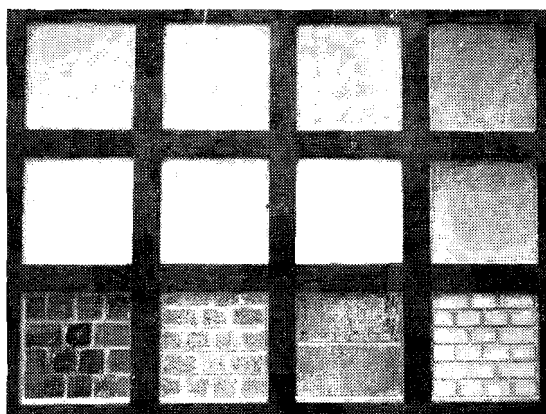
Test house on Holzkirchen test site for making comparative tests with plaster; part of west exterior wall with built-in test pieces.
